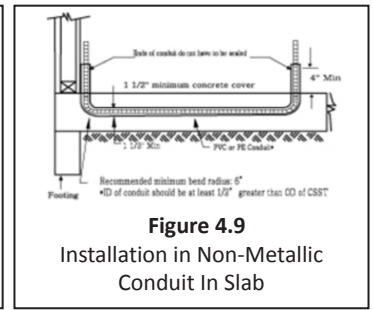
Installation in Non-Metallic Conduit In Slab
